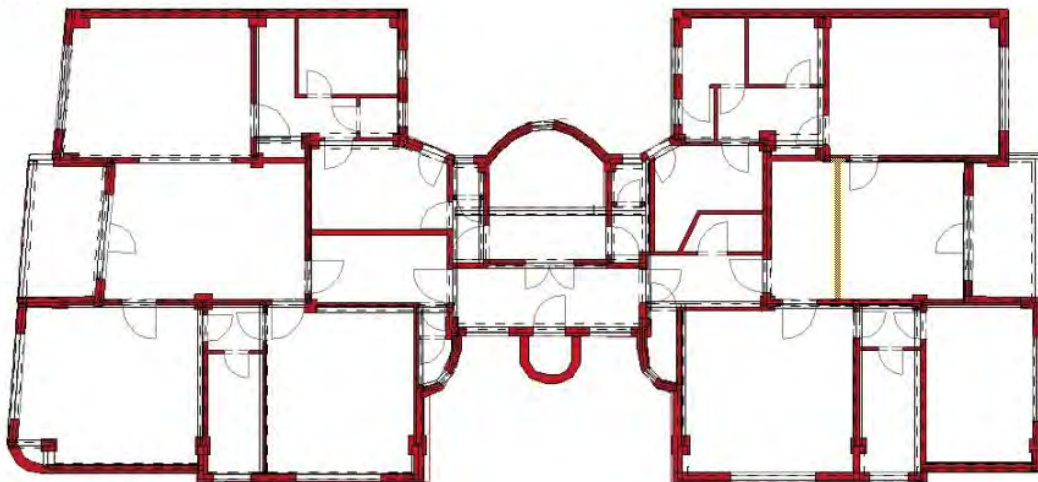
Architectural plan of a current floor (after Bostenaru, 2004). Yellow marks new partition walls.
